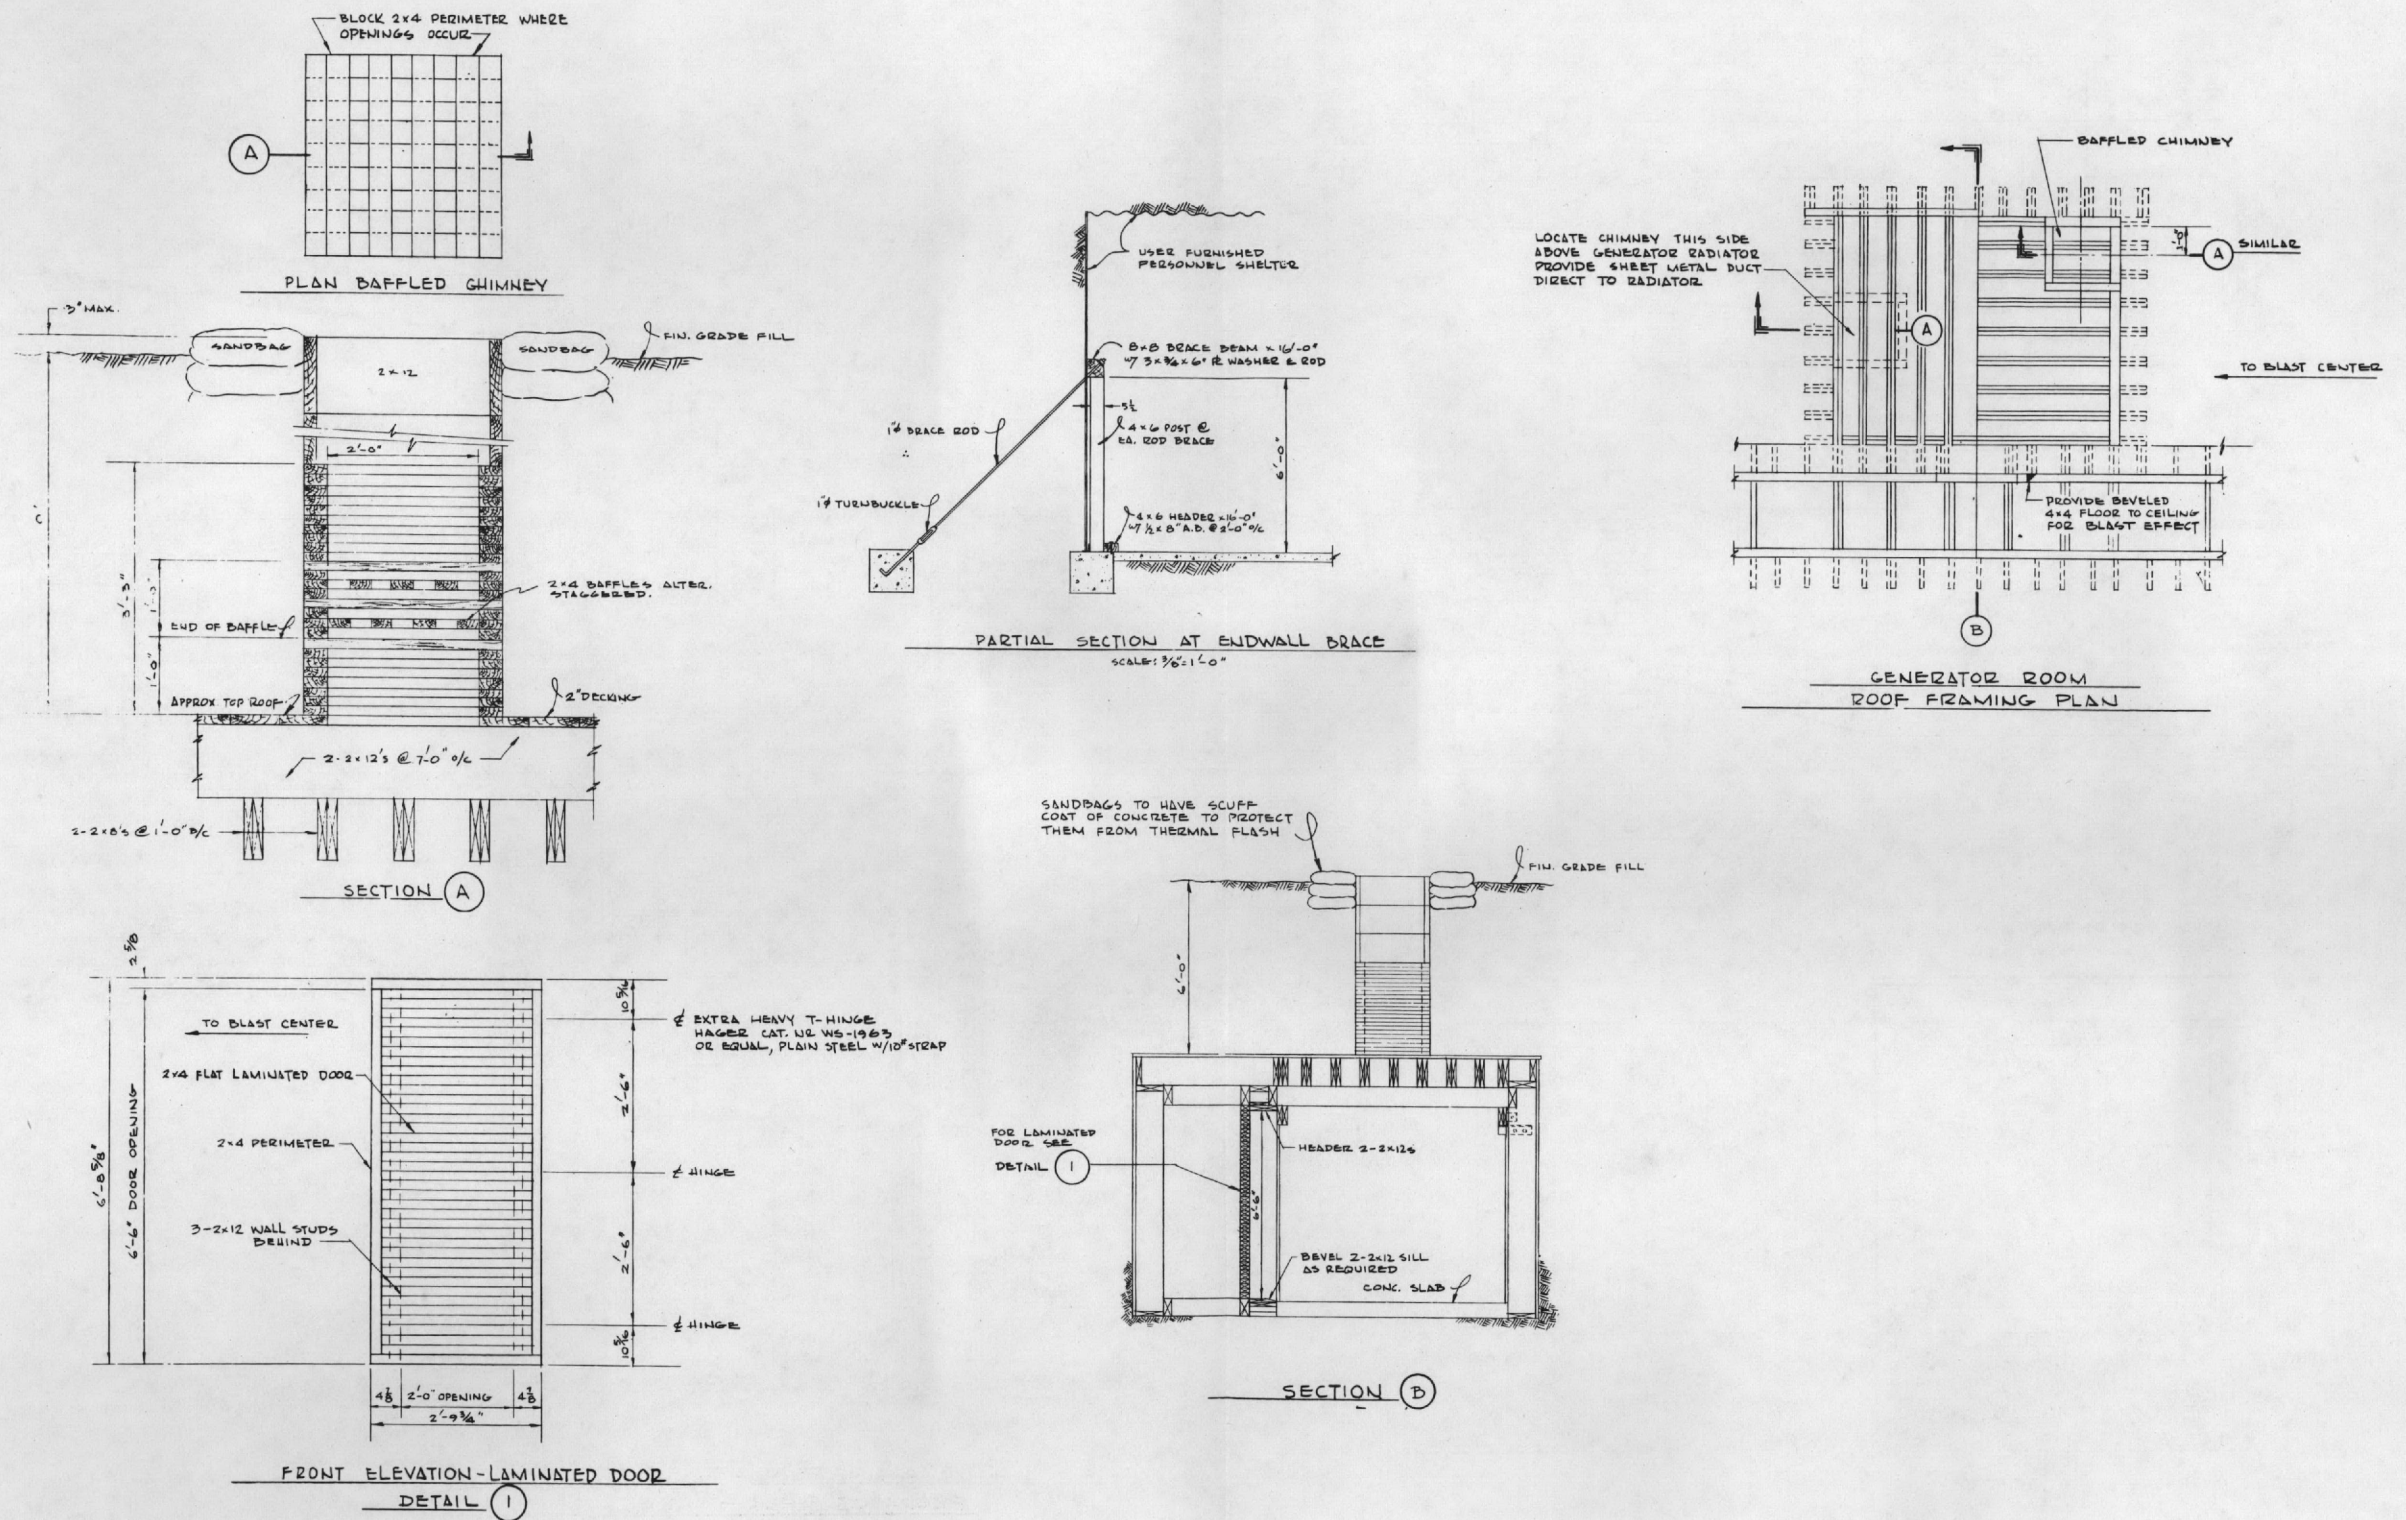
Underground Personnel Shelter - Door and Chimney Plan Section and Details.
